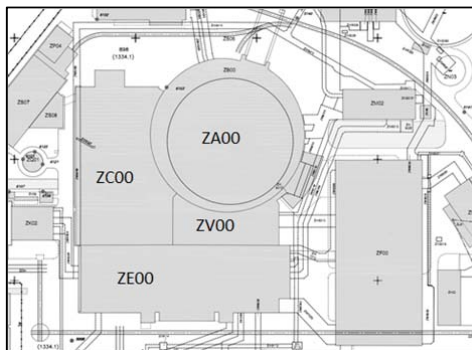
Gösgen Reactor Building and Surrounding Structures - Plan View
